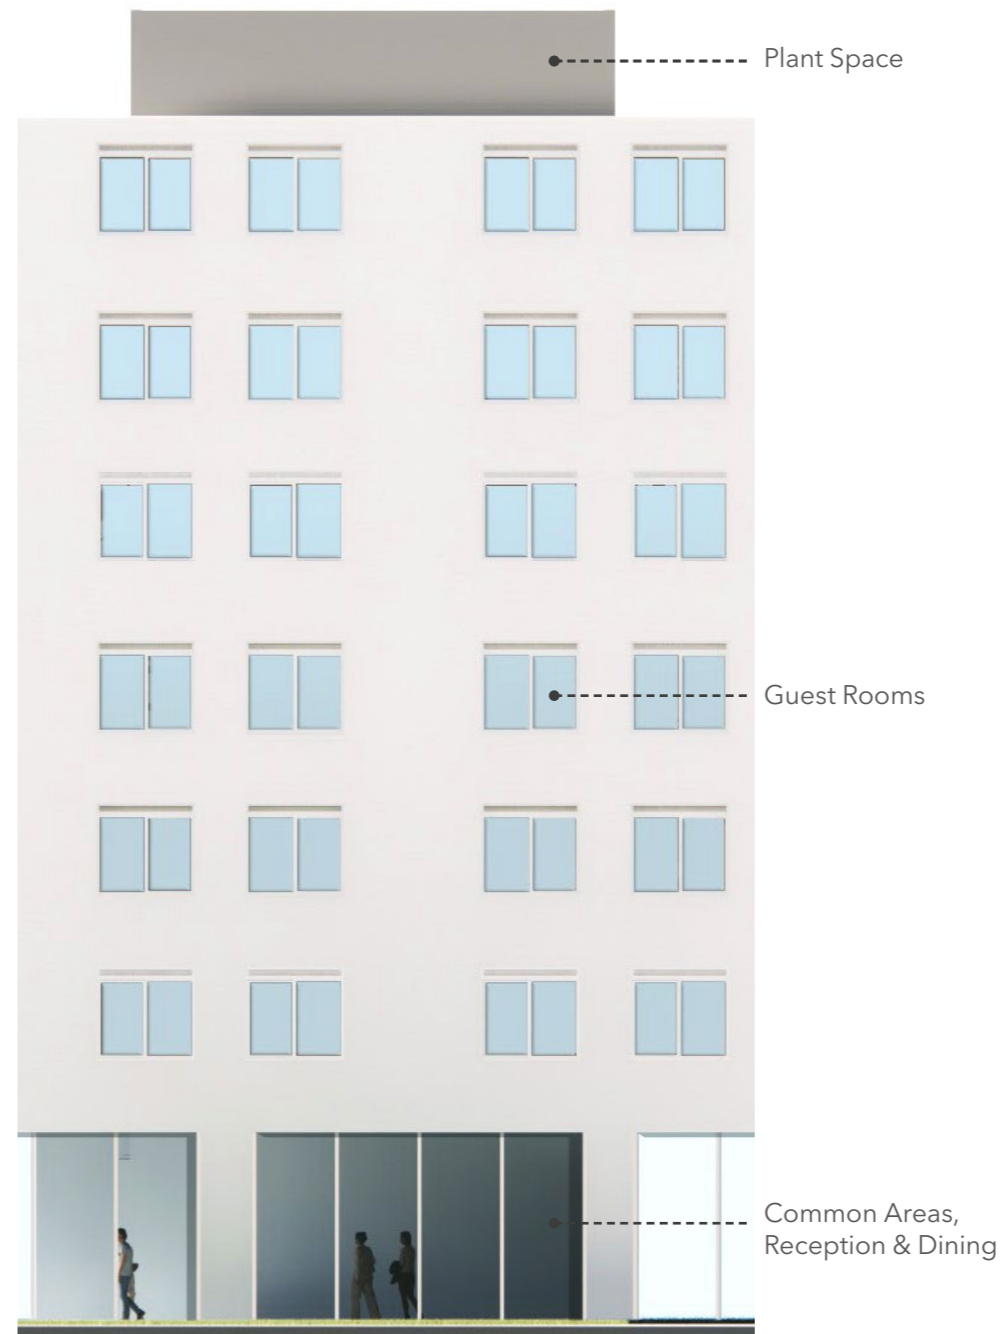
Indicative Elevation showing Typical 'Commercial Building' Design
